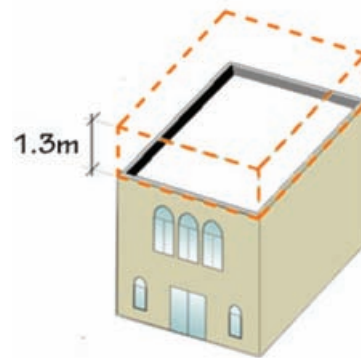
Typical House 1 Virtual RWH Roof Reservoir
